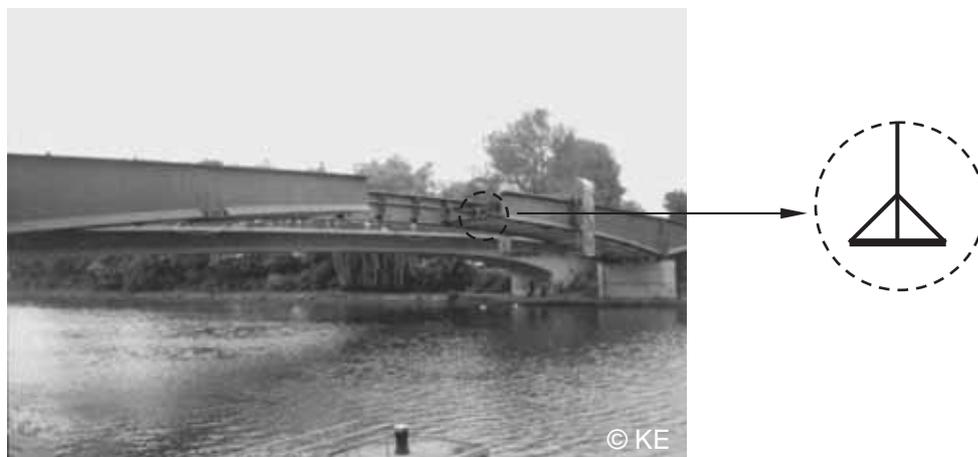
I-girder with inclined flange plates at the bottom flange.
